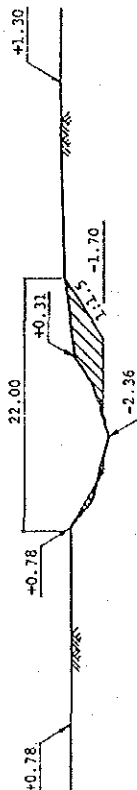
PROFILE OF DRAIN (BANG NA DRAINAGE AREA)
